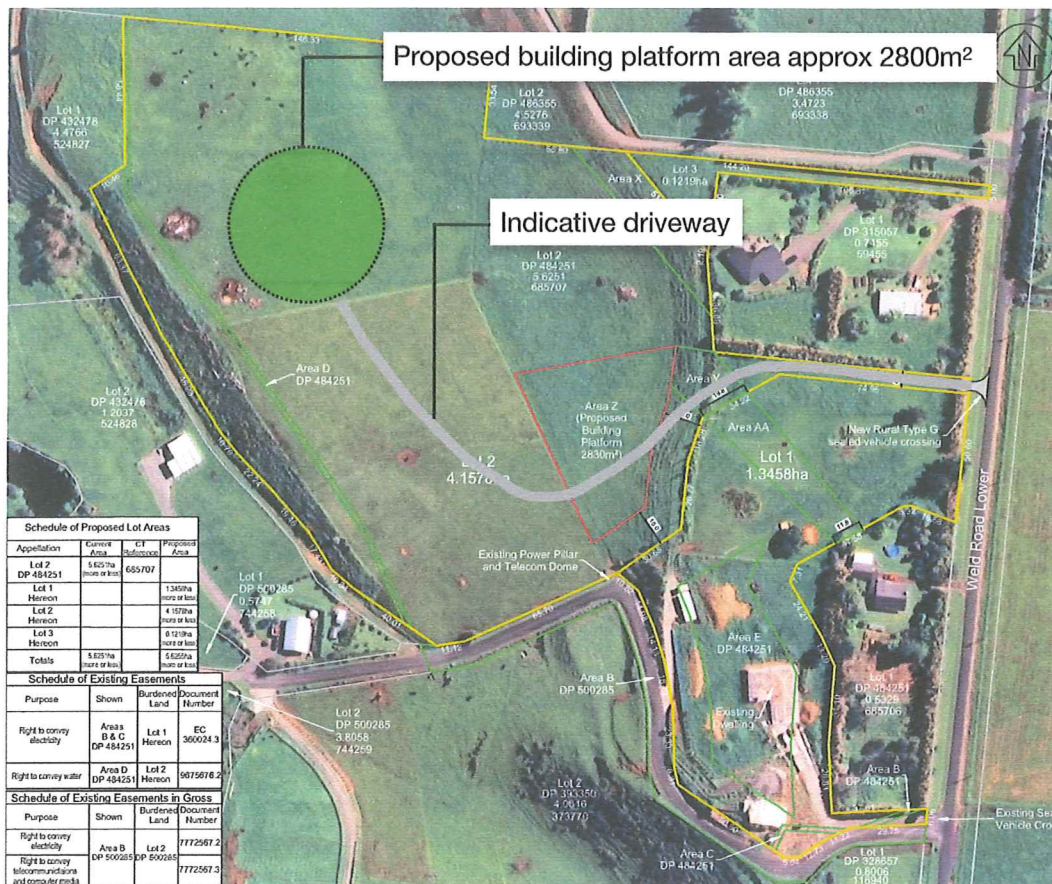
Clip from Taylor Patrick Surveyors Scheme Plan with new dwelling site overlaid
